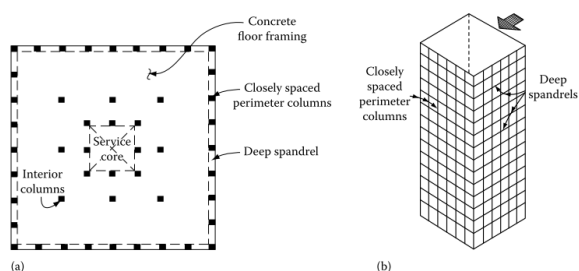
Frame tube building. (a) Schematic plan and (b) isometric view.
